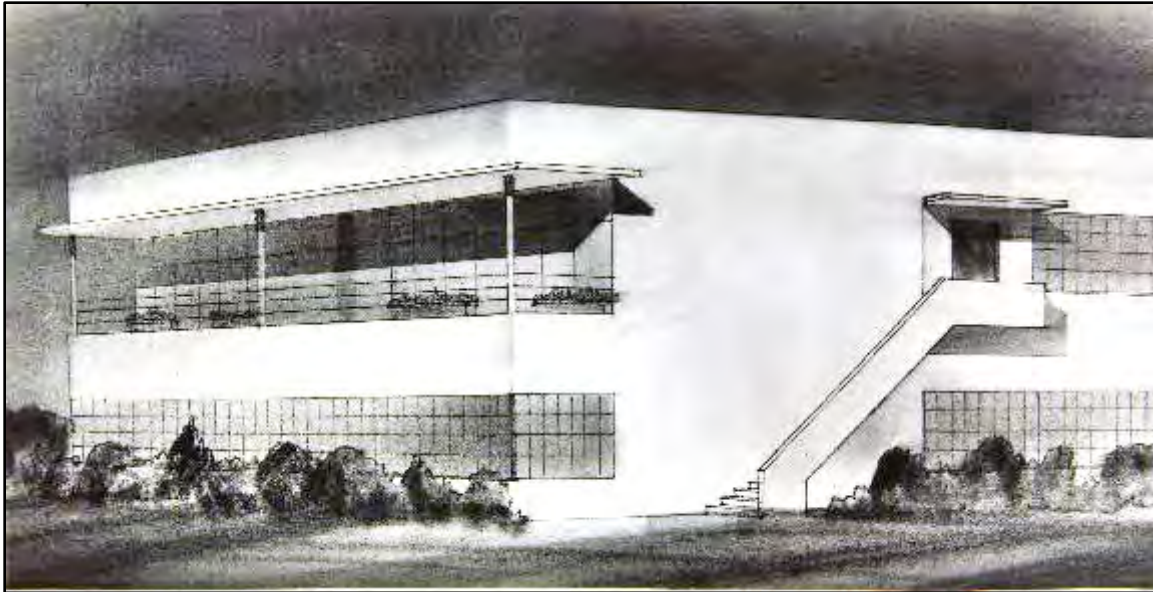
Building 4, Architect's Rendering, 1941
